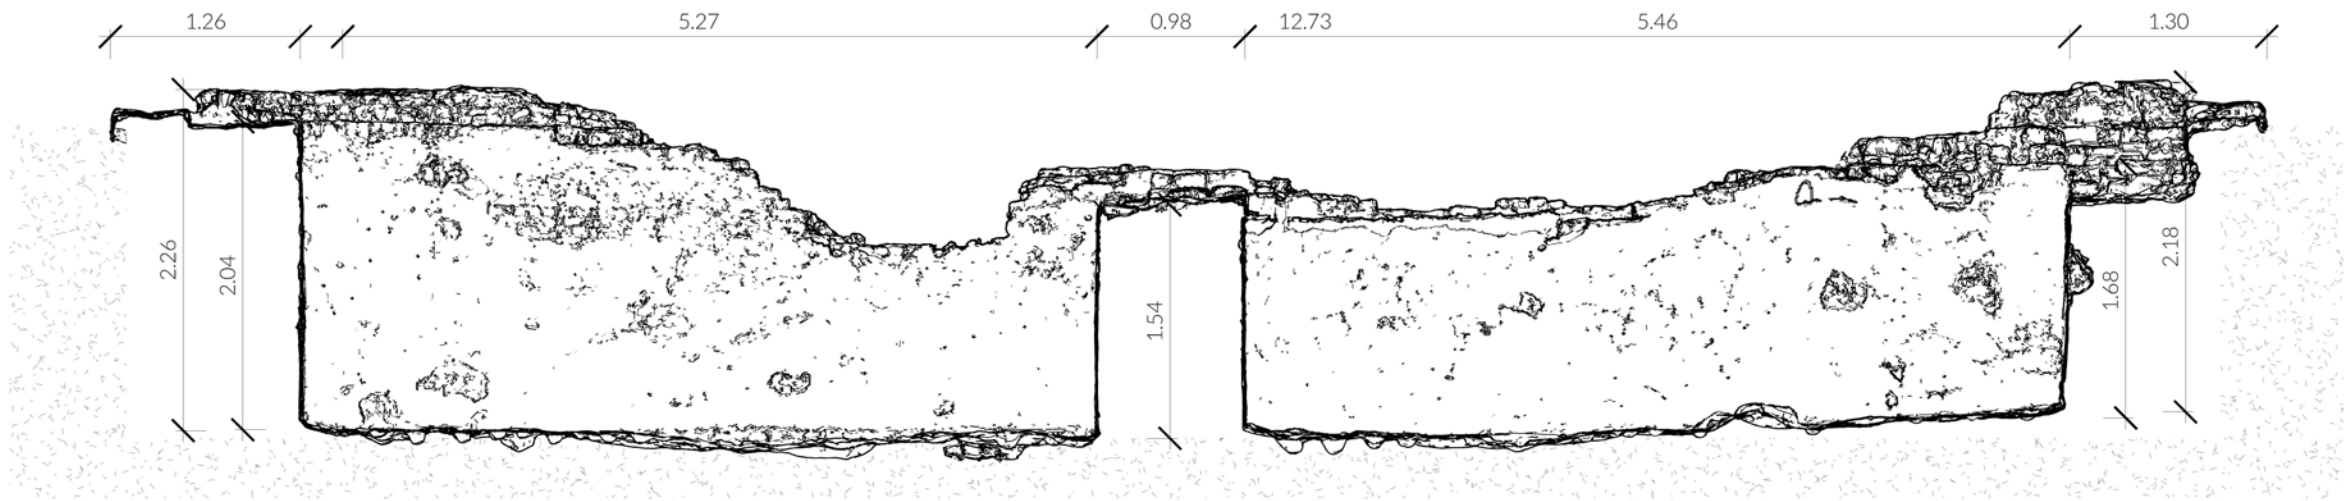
Section through YKK6 - YKK5, east walls, 1:50
